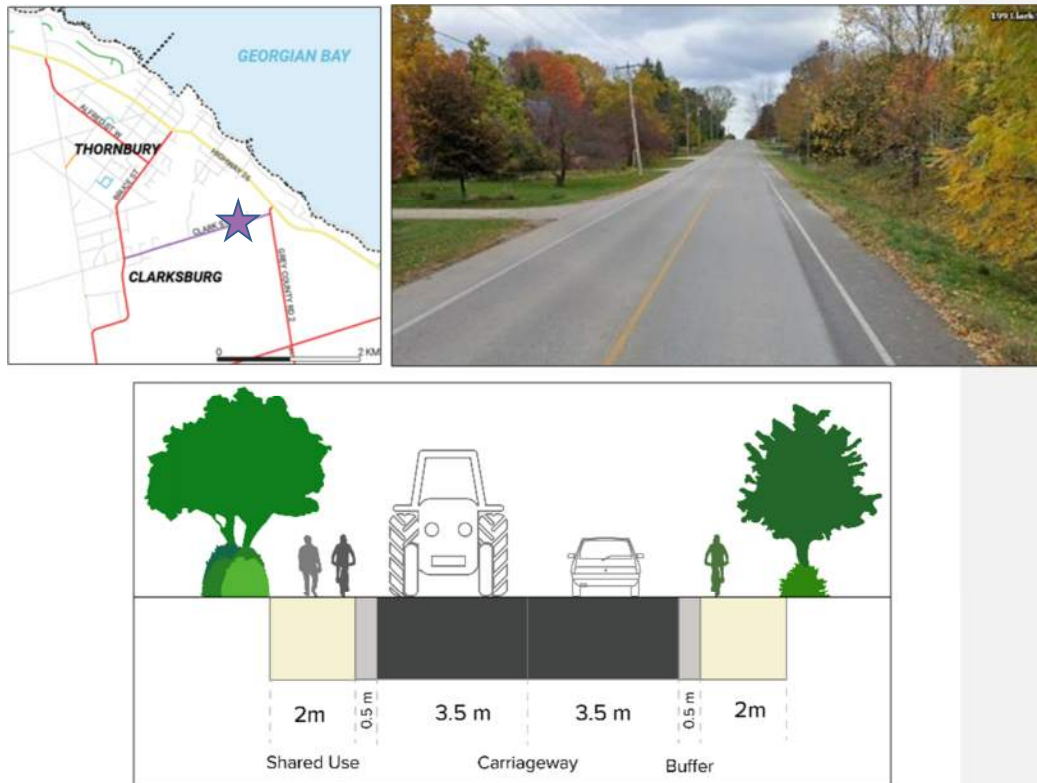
Potential Cross-Section Treatment for Clark Street
